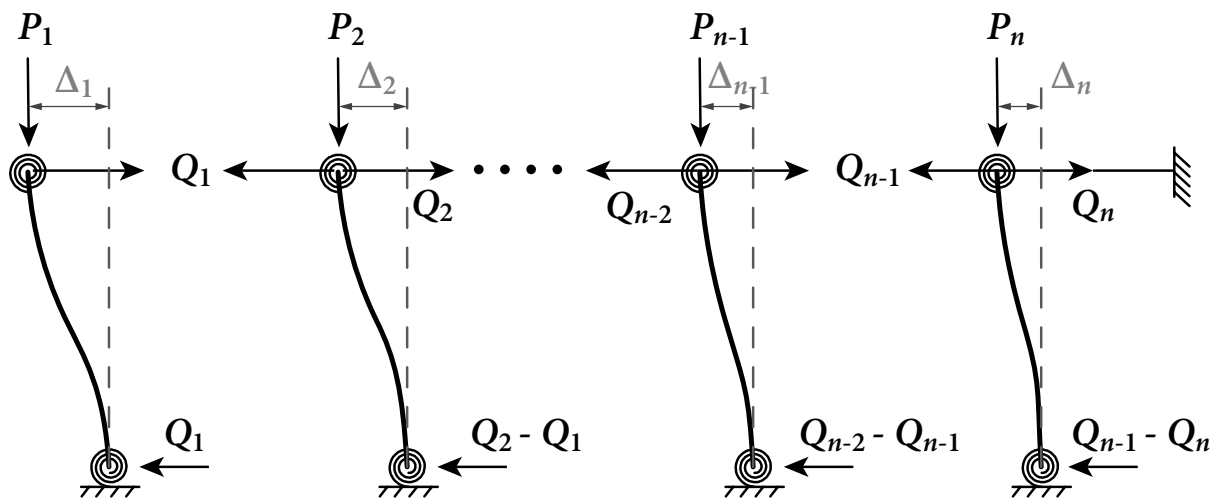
A storey frame anchored on one side subjected to gravity loading
